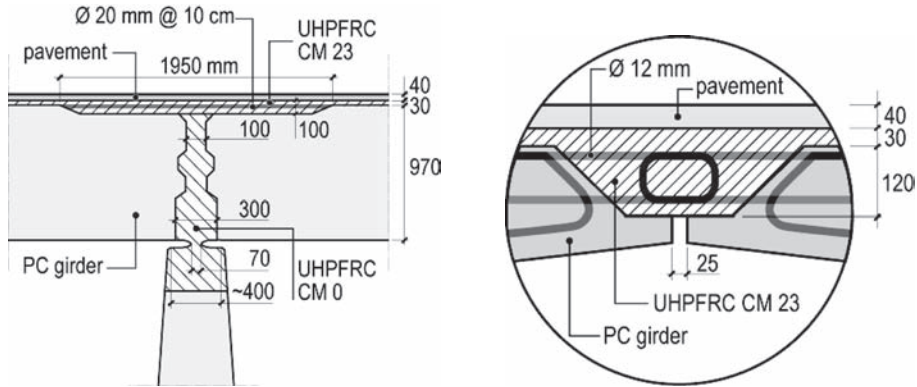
(a) Detail 1: middle support, and (b) Detail 2: longitudinal joint between prefabricated girders.
